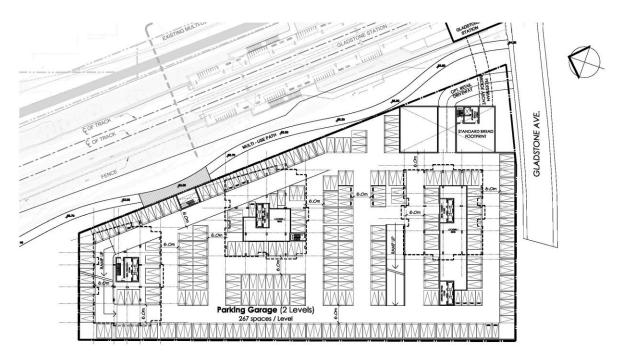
Garage plan of the development illustrating a future basement level access corridor through the Standard Bread building's basement level, and a future multi-use pathway adjacent to the railway corridor that will be accessible from a terrace adjacent to the common lobby of towers 2 and 3. Source: Hobin Architecture 2018.
